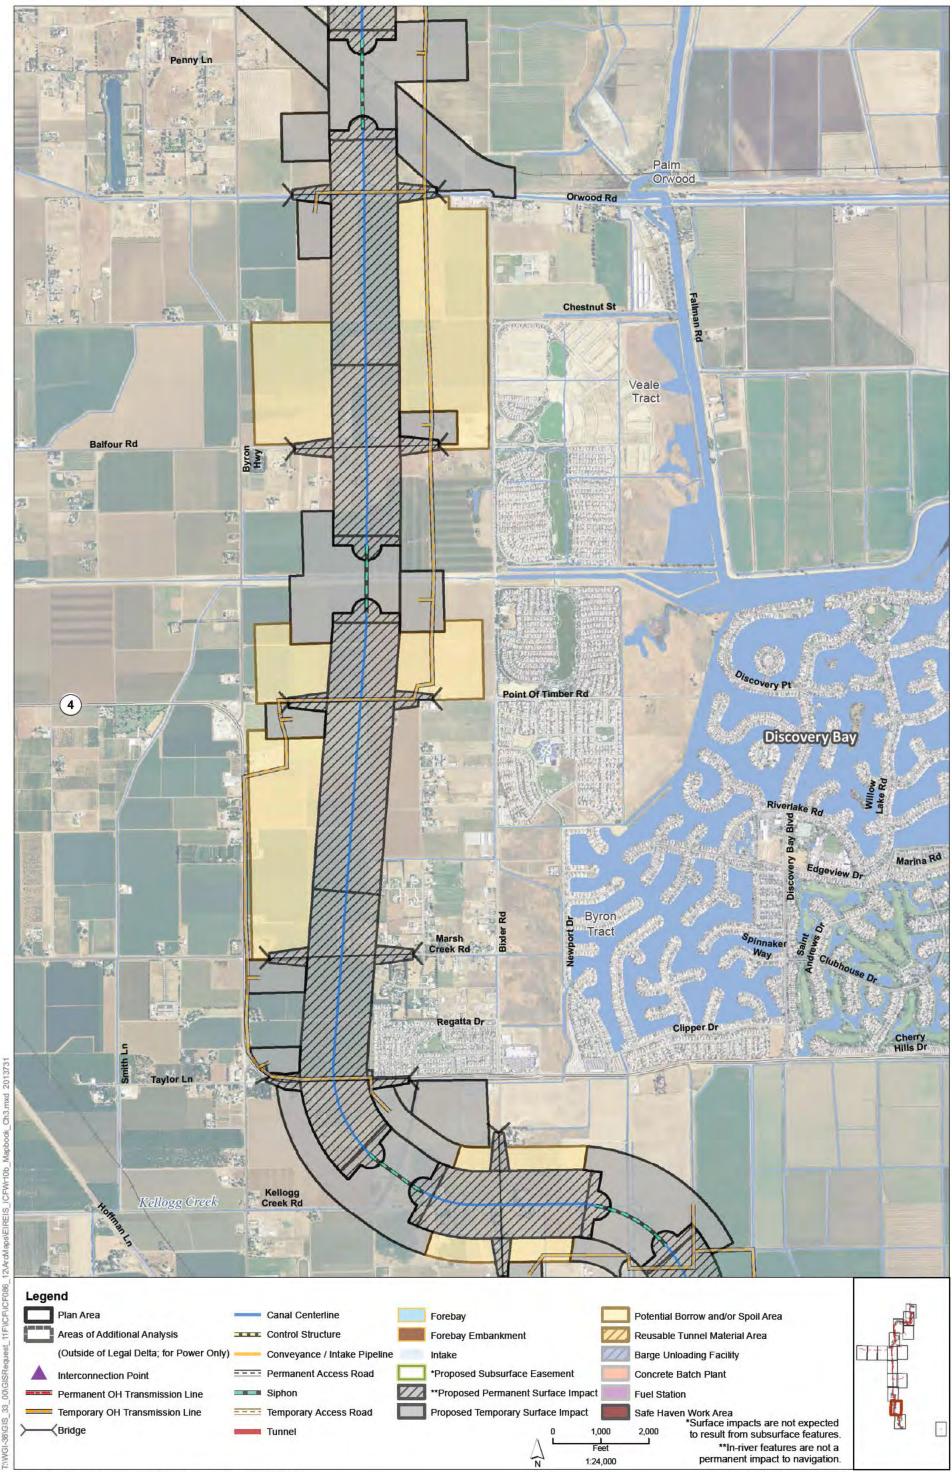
Sheet 15 of 17 West Alignment (Alternatives 1C, 2C, and 6C)
